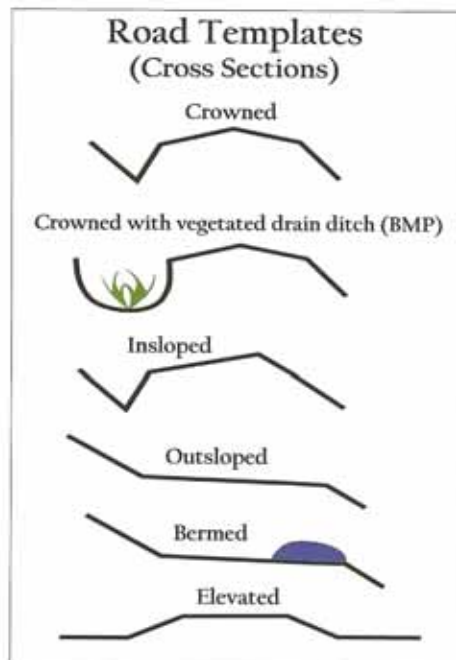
Alternative cross sections used to assure sufficient cross sloping and drainage.
